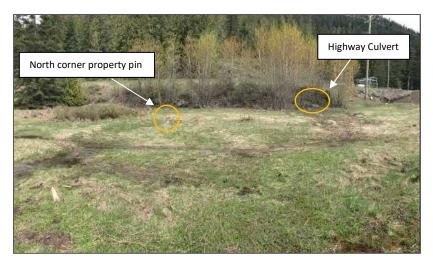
Location of highway culvert and north corner of the property (May 10, 2023).
